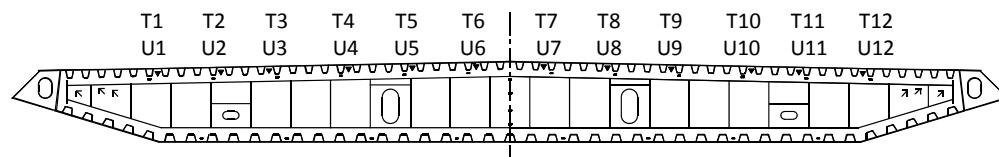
Layout of Strain Gauges at Mid-span Cross-section of the Girder
